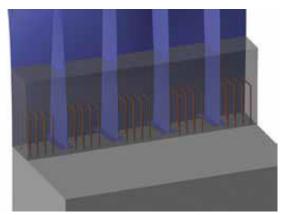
Connection of consisting concrete structure with the steel frame (Cement, 2013)
